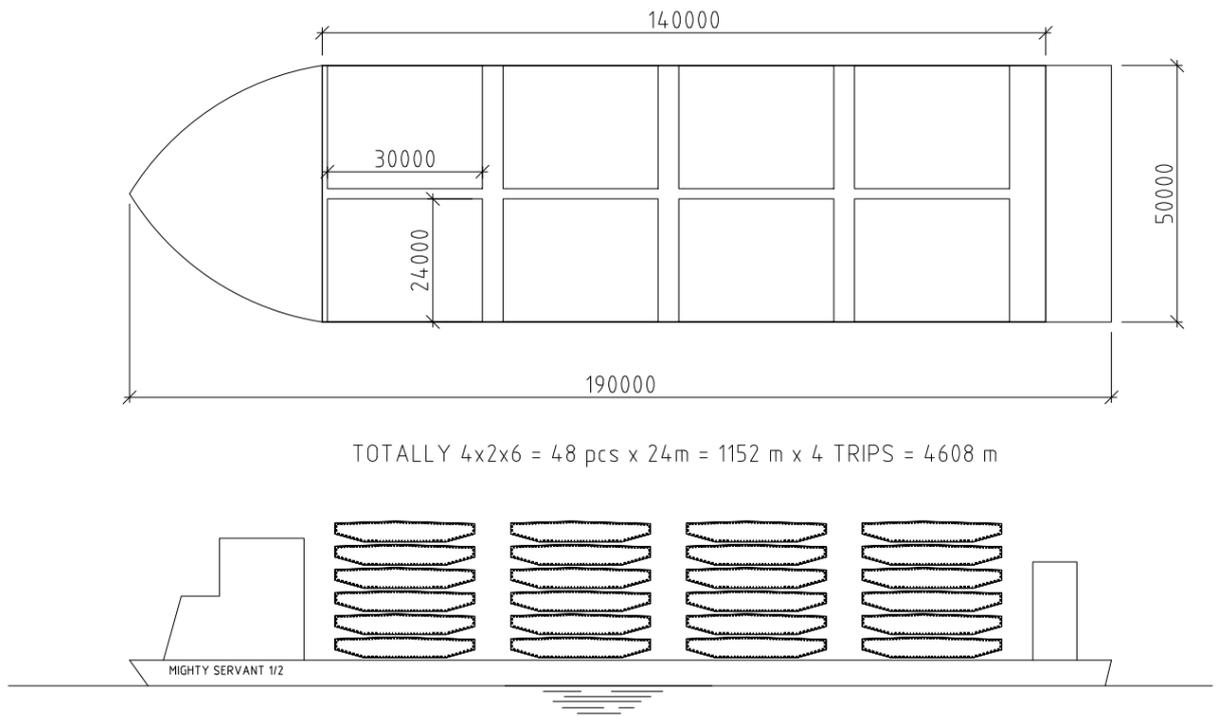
Stacking of Bridge Girder Sections on Mighty Servant
